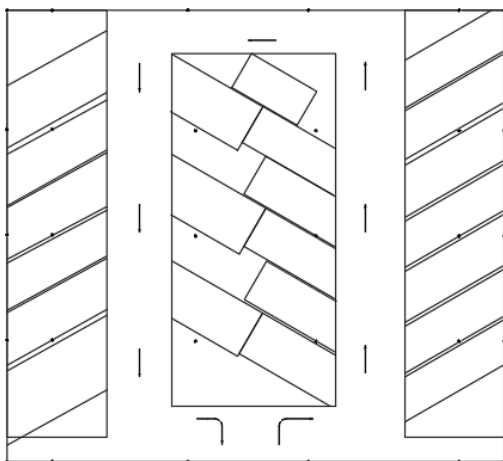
Parking facilities are designed so that every free space can be easily accessible.
